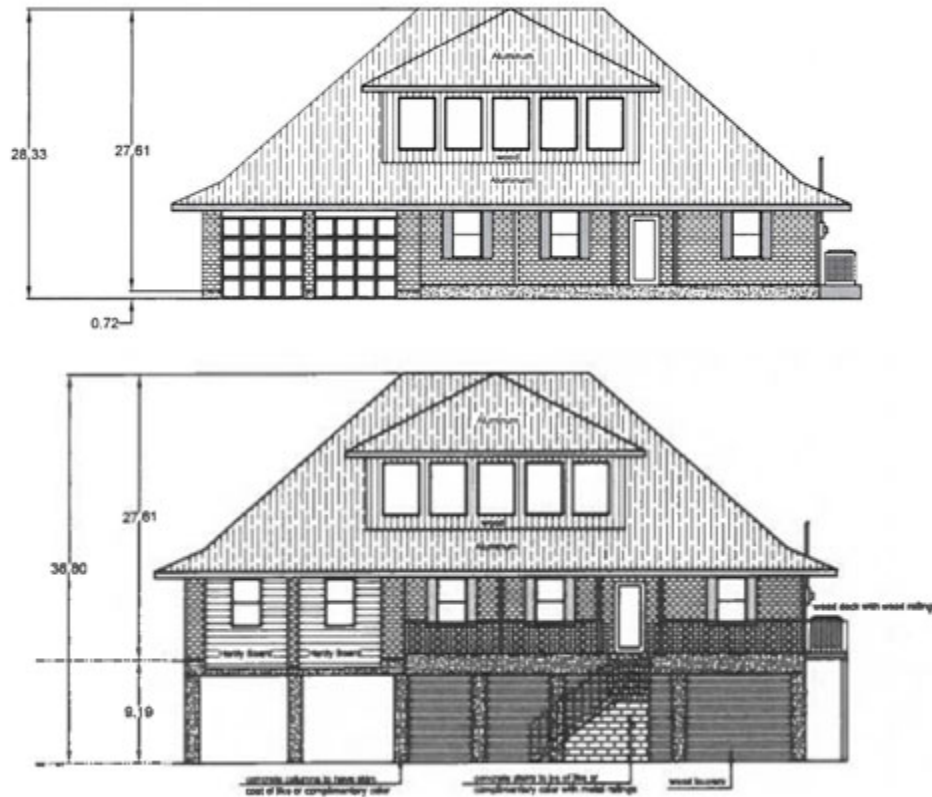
Elevations showing existing (top) and proposed (bottom) height
